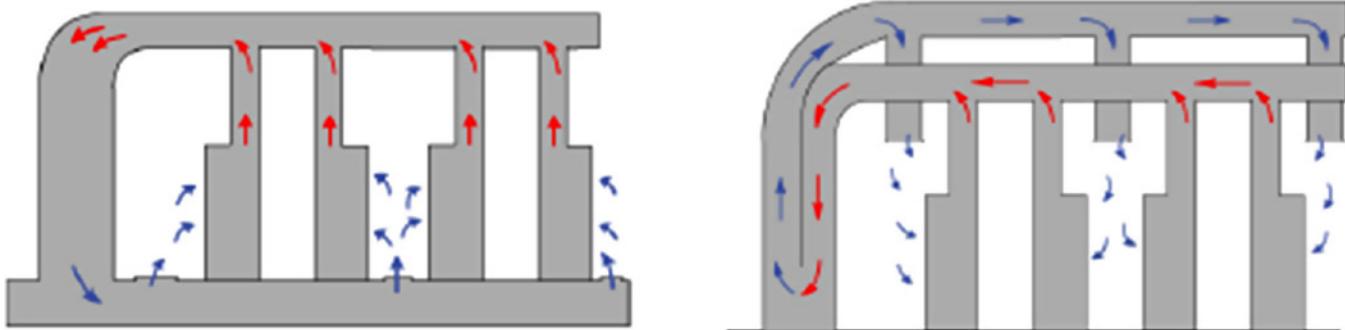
Fully ducted return—locally ducted supply (Left, Raised floor; Right, Overhead). Courtesy of Schneider Electric.
